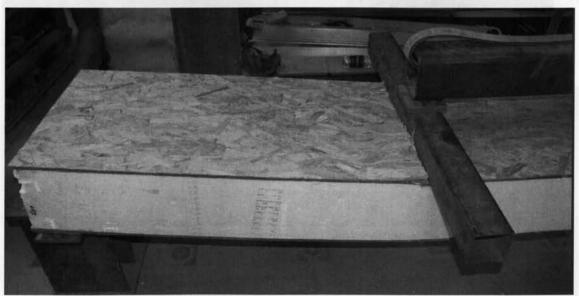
View of panel S-5 after failure showing OSB top facing crushing at the quarter point load location
